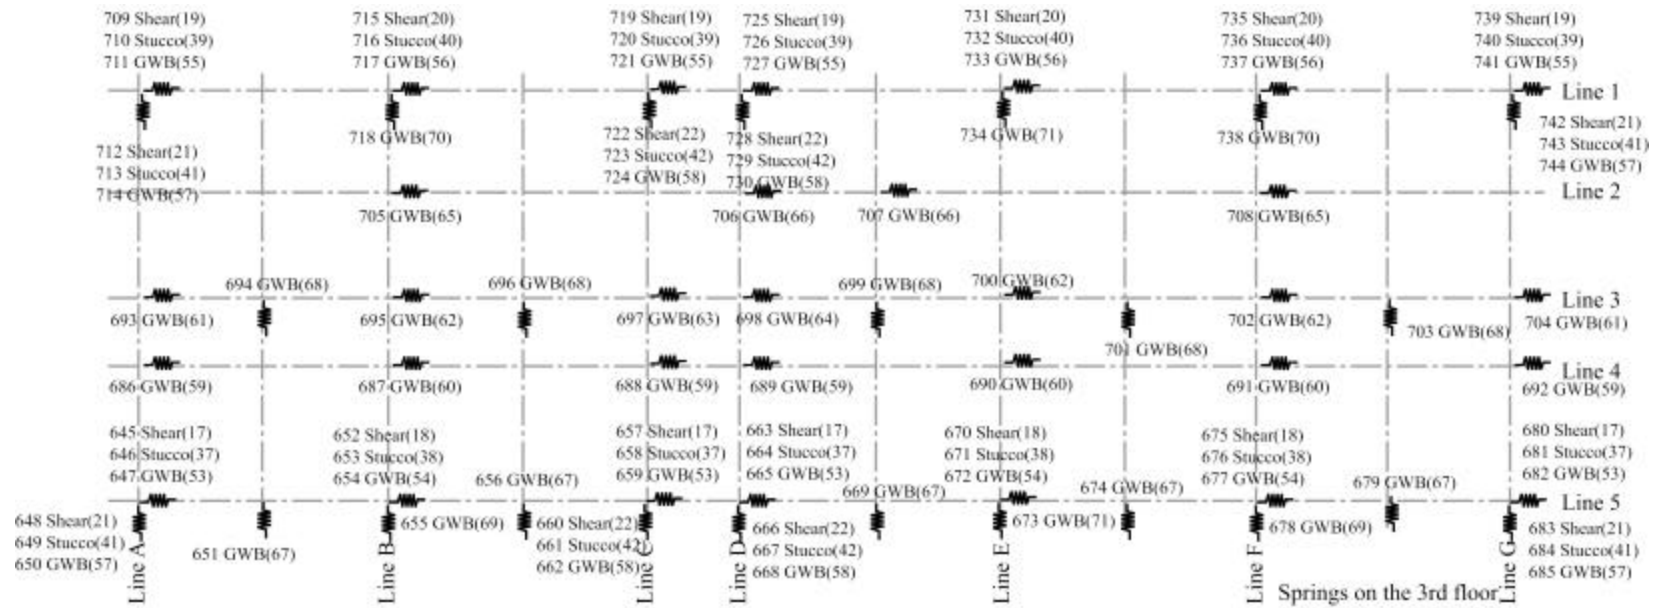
Locations, Orientation and Numbering of Shear Element for Interior and Exterior Vertical Walls on the Third Floor of the Apartment Index Building (continued).
